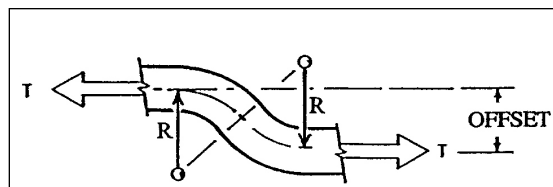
Transition offset in the pipe wall from pipe to bell at critical radius, R .
